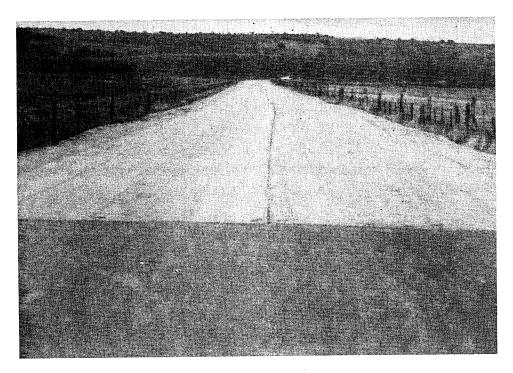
Beginning of the roller-compacted concrete (RCC) roadway looking from sta 0 + 00 left-Lane II, right-Lane I
